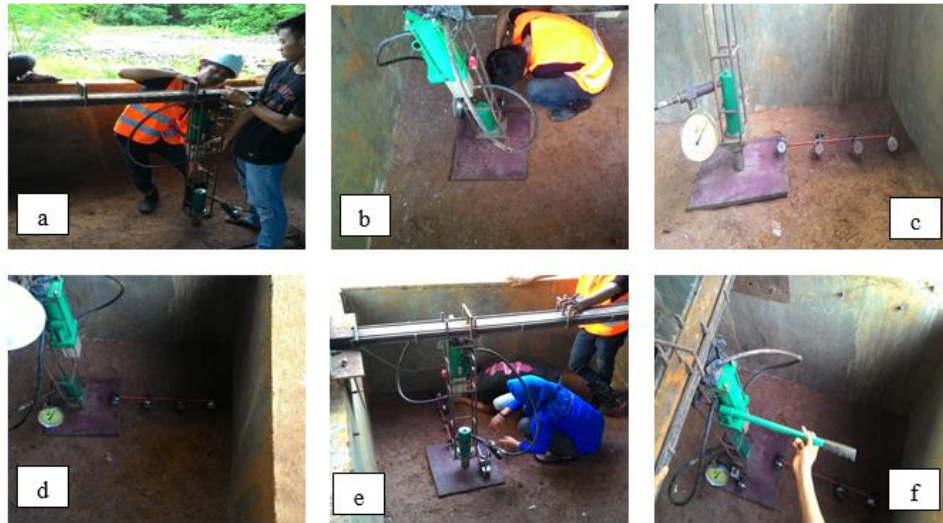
Model testing procedure; a) installation of test apparatus, b) dial gauge installation, c and d) hydraulic setting, e) dial reading, and f) loading test
